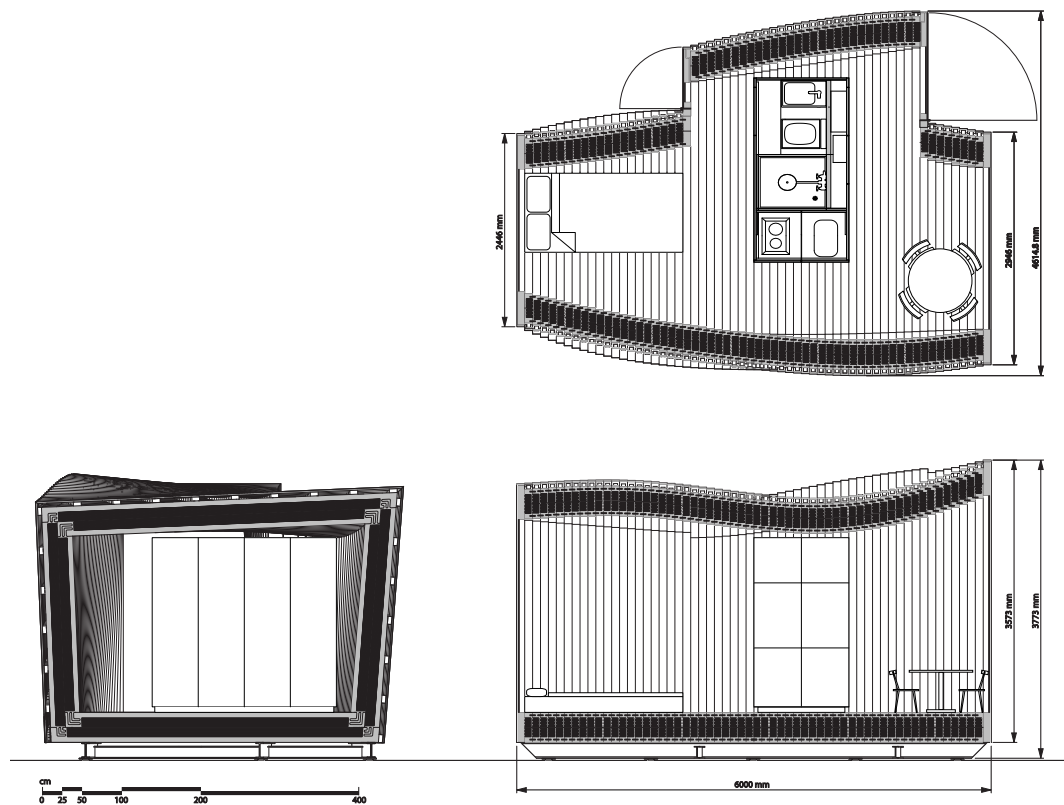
Plan and Sections of IBA: Timber Prototype House
